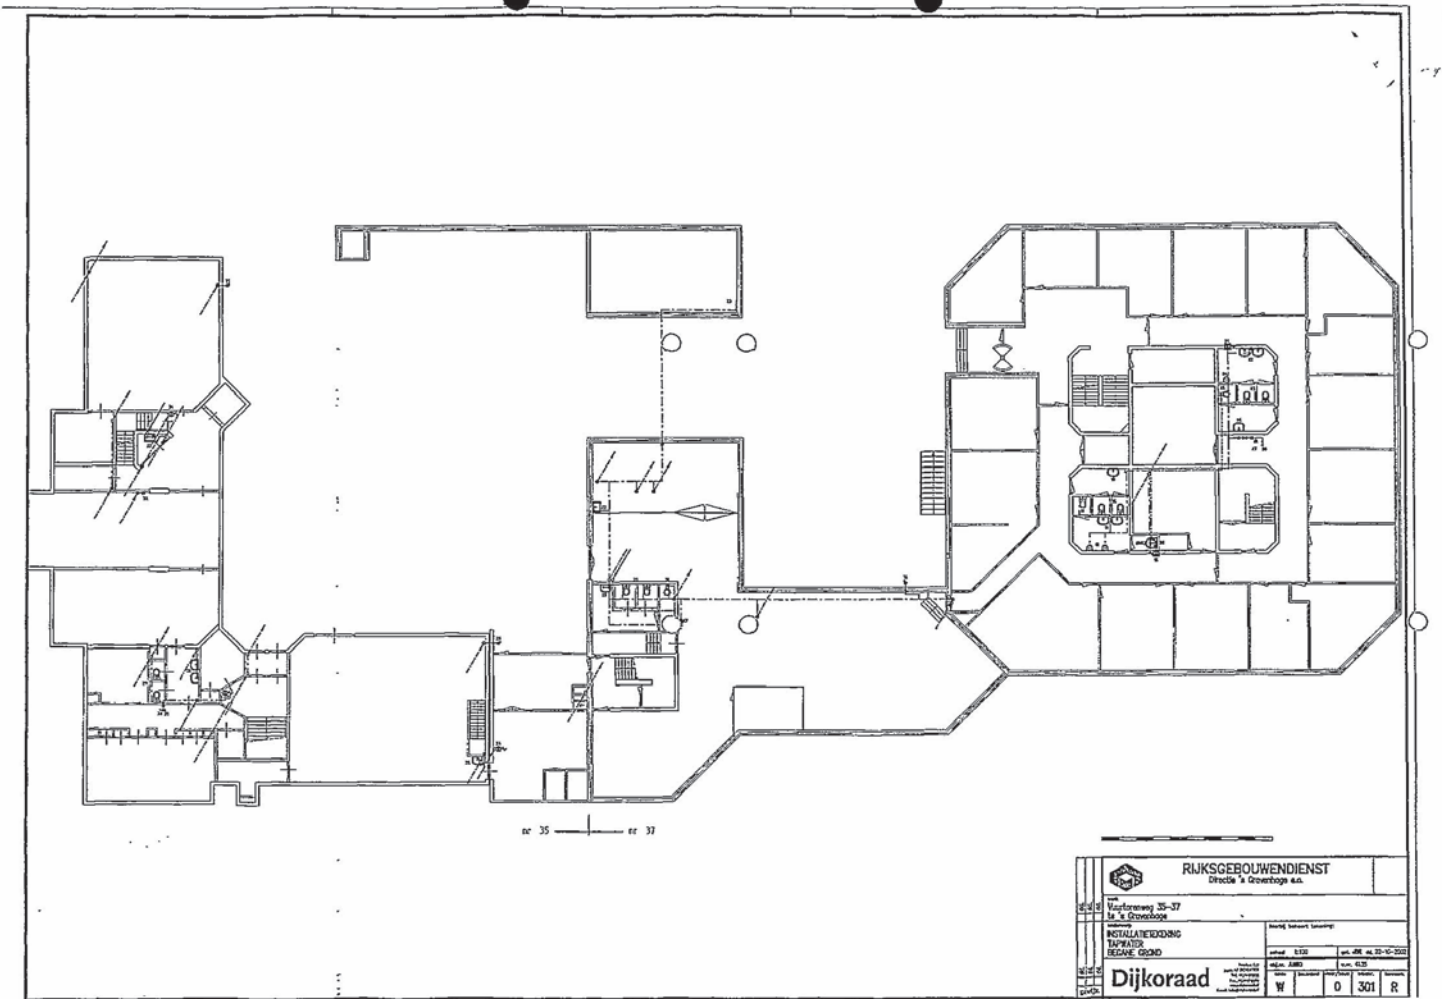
Existing building, original floor plan of ground floor. Southeast is facing up.
